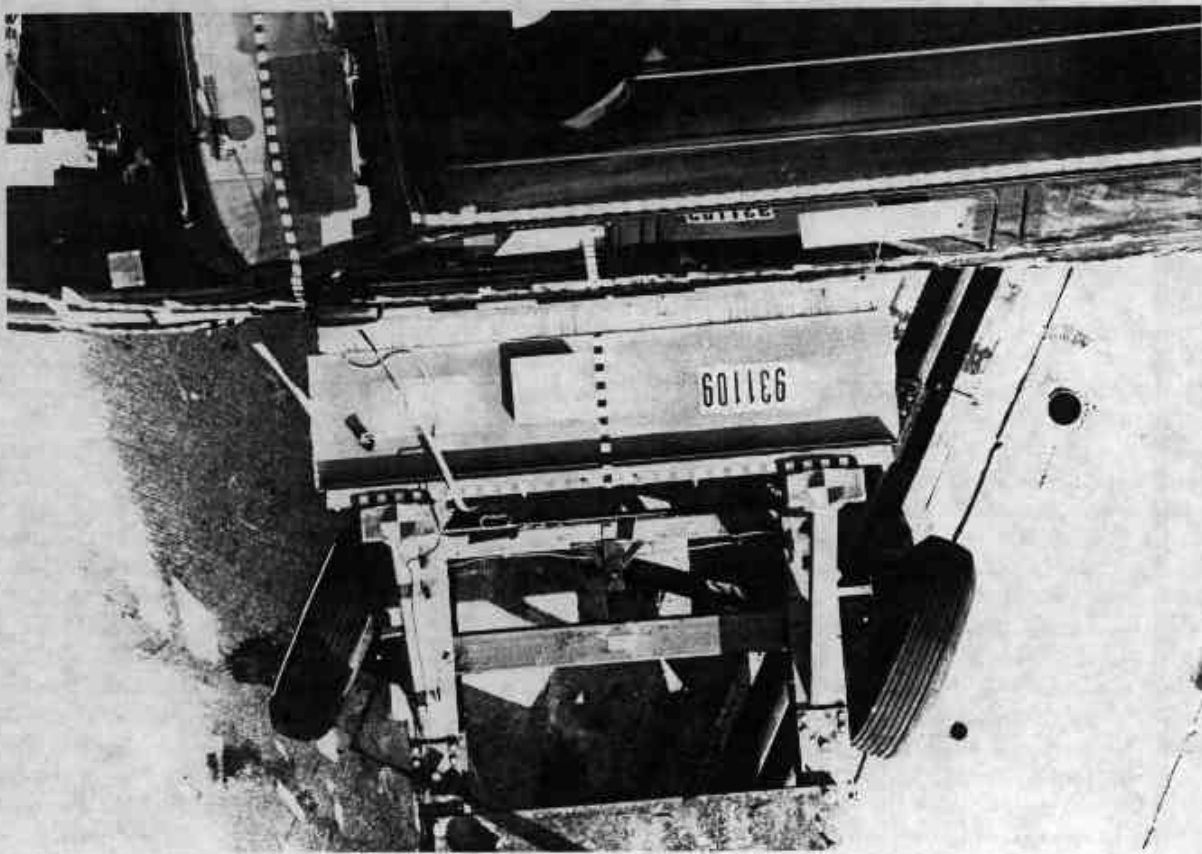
PRE-TEST OVERHEAD CLOSE-UP VIEW
